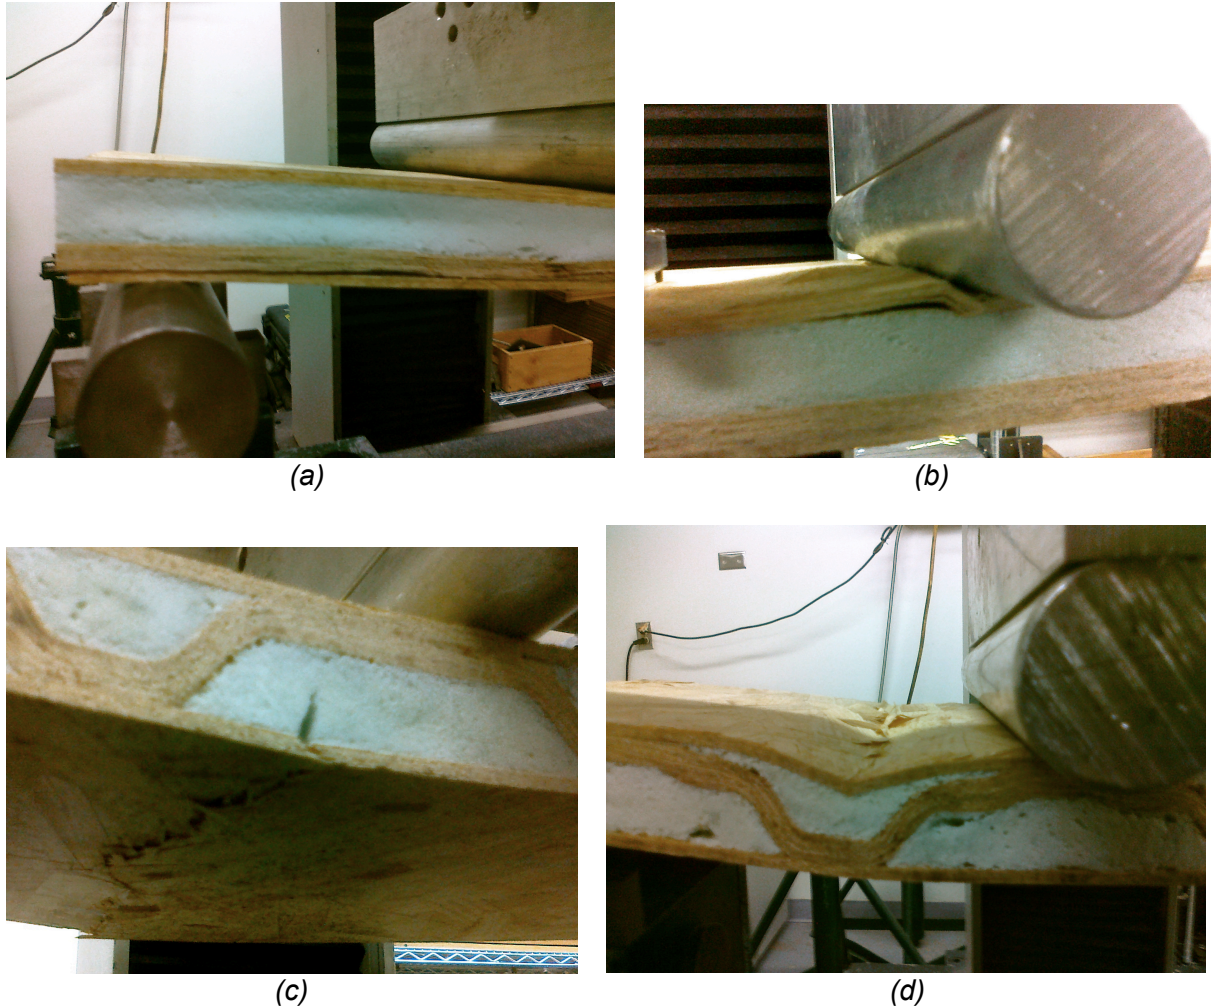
(a) Longitudinal flexural specimen failure between core and bottom ply. (b) Top ply buckling for longitudinal specimen. (c) Transverse flexural specimen failing in bottom ply tension. (d) Top ply buckling of transverse specimen.
